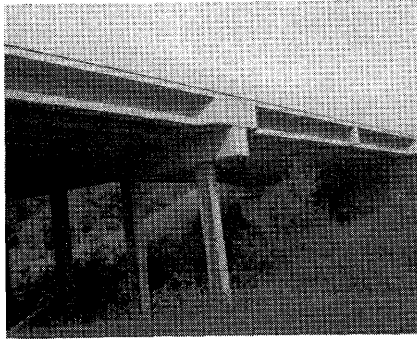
View of underside of bridge showing beam arrangement, diaphragm and end blocks.
